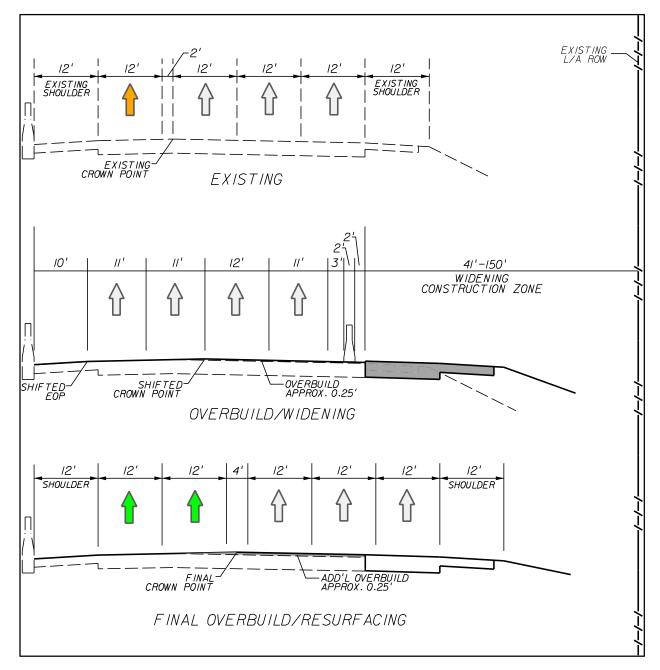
Maintenance of Traffic Typical Section (Mainline Widening without Existing Auxiliary Lane)
